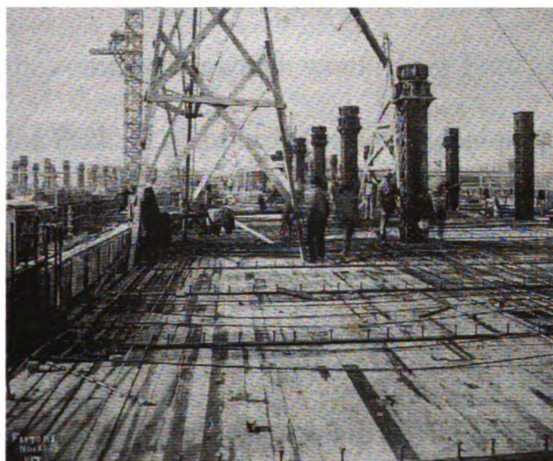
Photo of the construction of Highland Park in 1913. The floor was first constructed of wood and steel support braces were laid.
